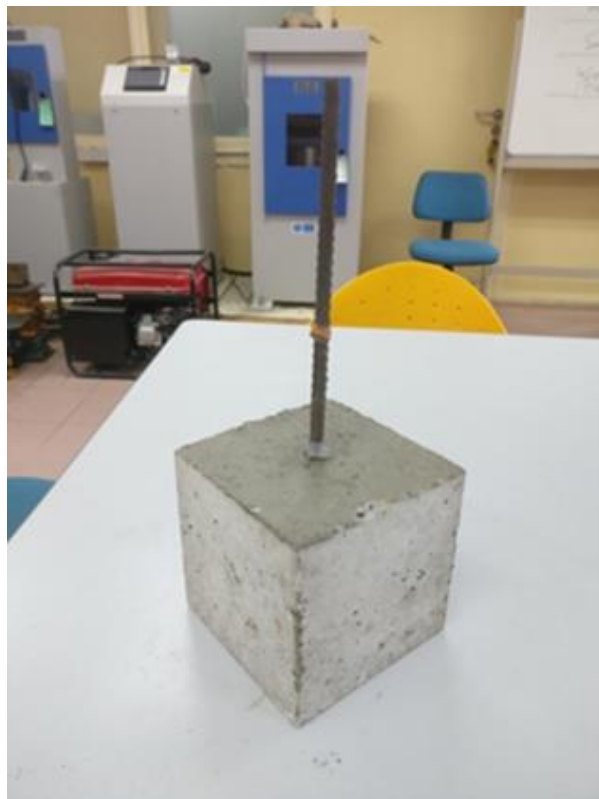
Pull-out specimen after de-moulding (a) 100 mm dimensional
